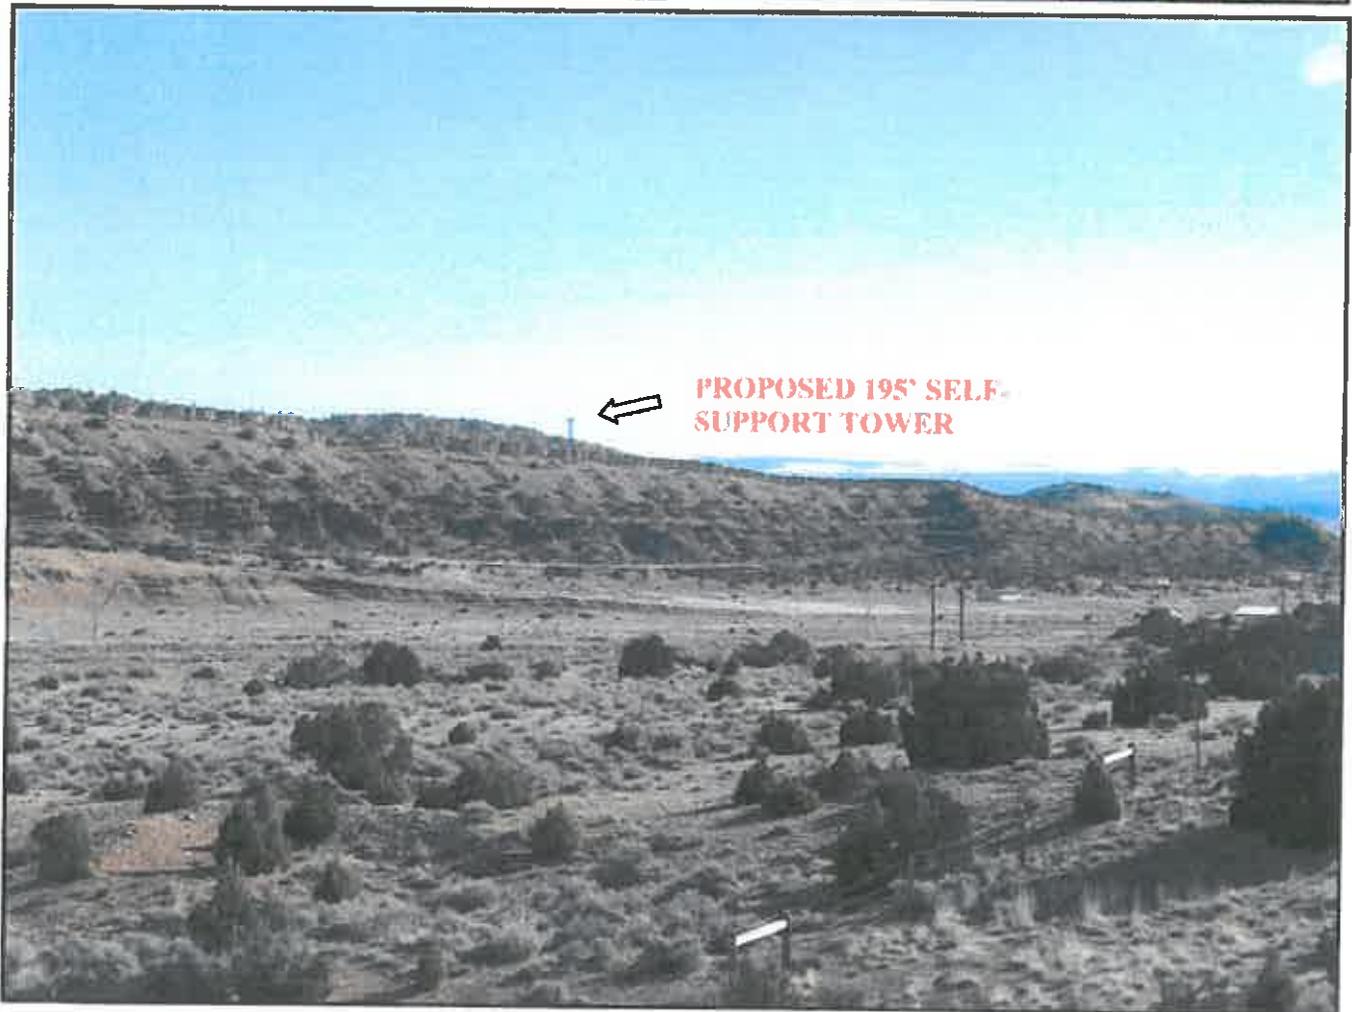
PHOTO RENDERING PROVIDED BY TOWER ENGINEERING PROFESSIONALS, INC.
